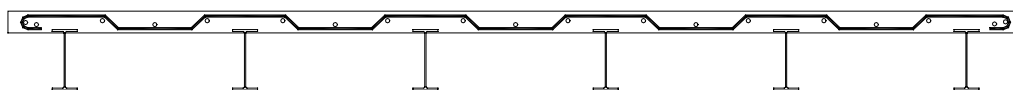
Longitudinal and transverse reinforcement in the bridge deck
